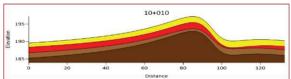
Cross-sectional Profiles Perpendicular to Trace of the Road Stretch at Study Points of Area
